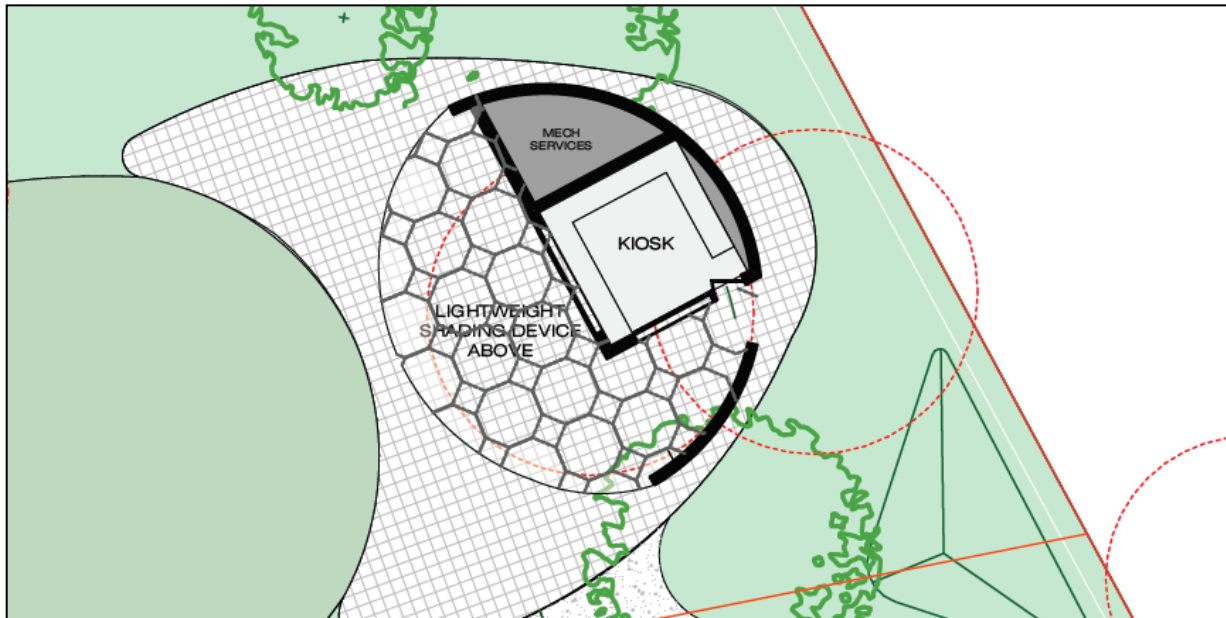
Proposed floor plan of kiosk with mechanical services and shading device overhead.
